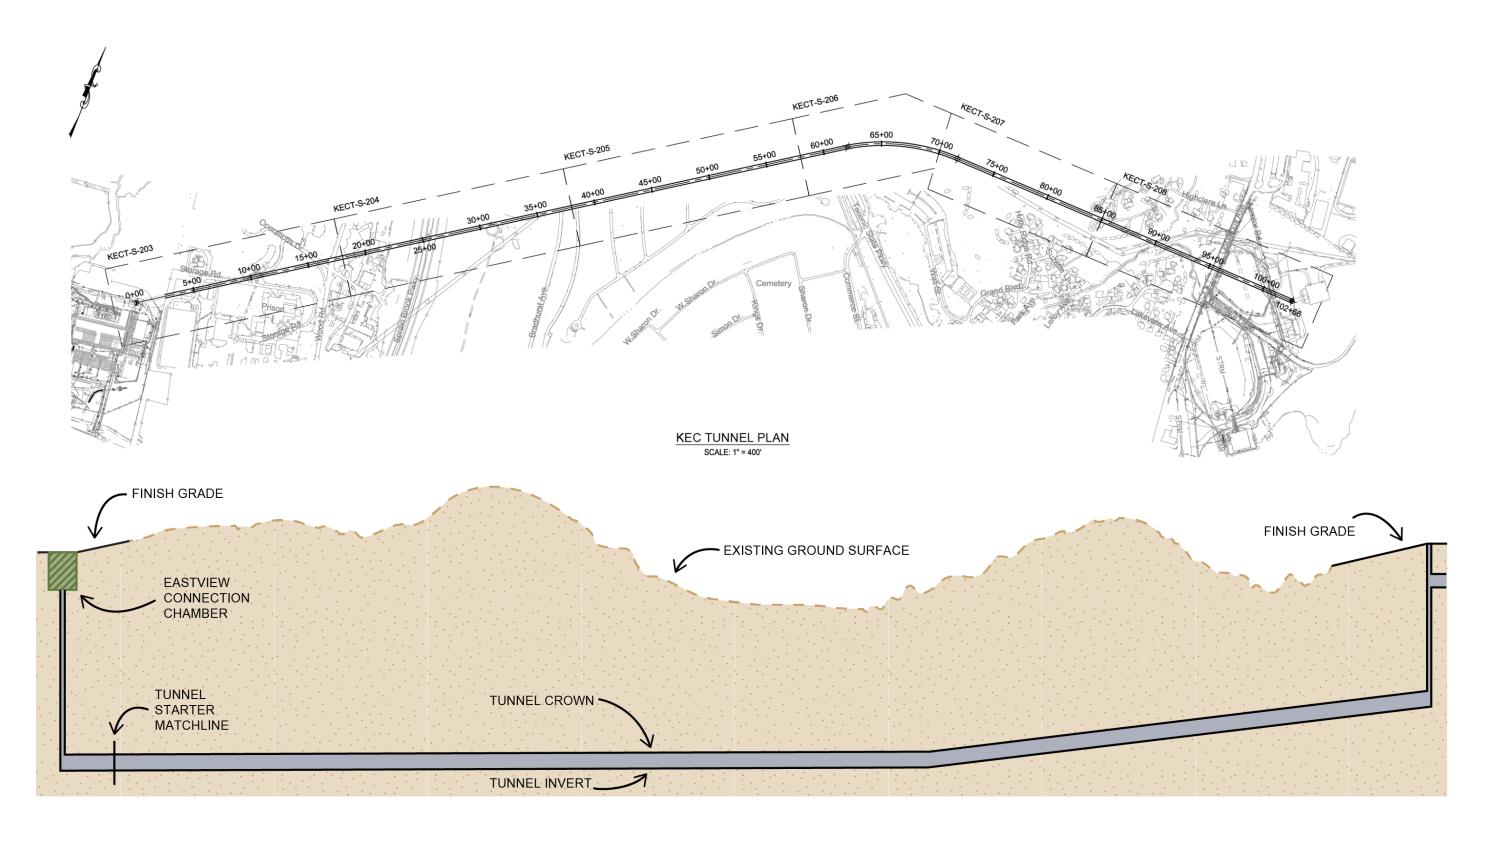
KEC Tunnel – Overall Plan and Profile
